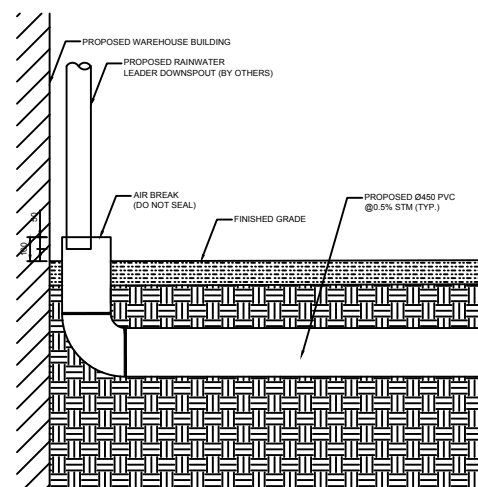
TYPICAL SEWER CROSS-SECTION
